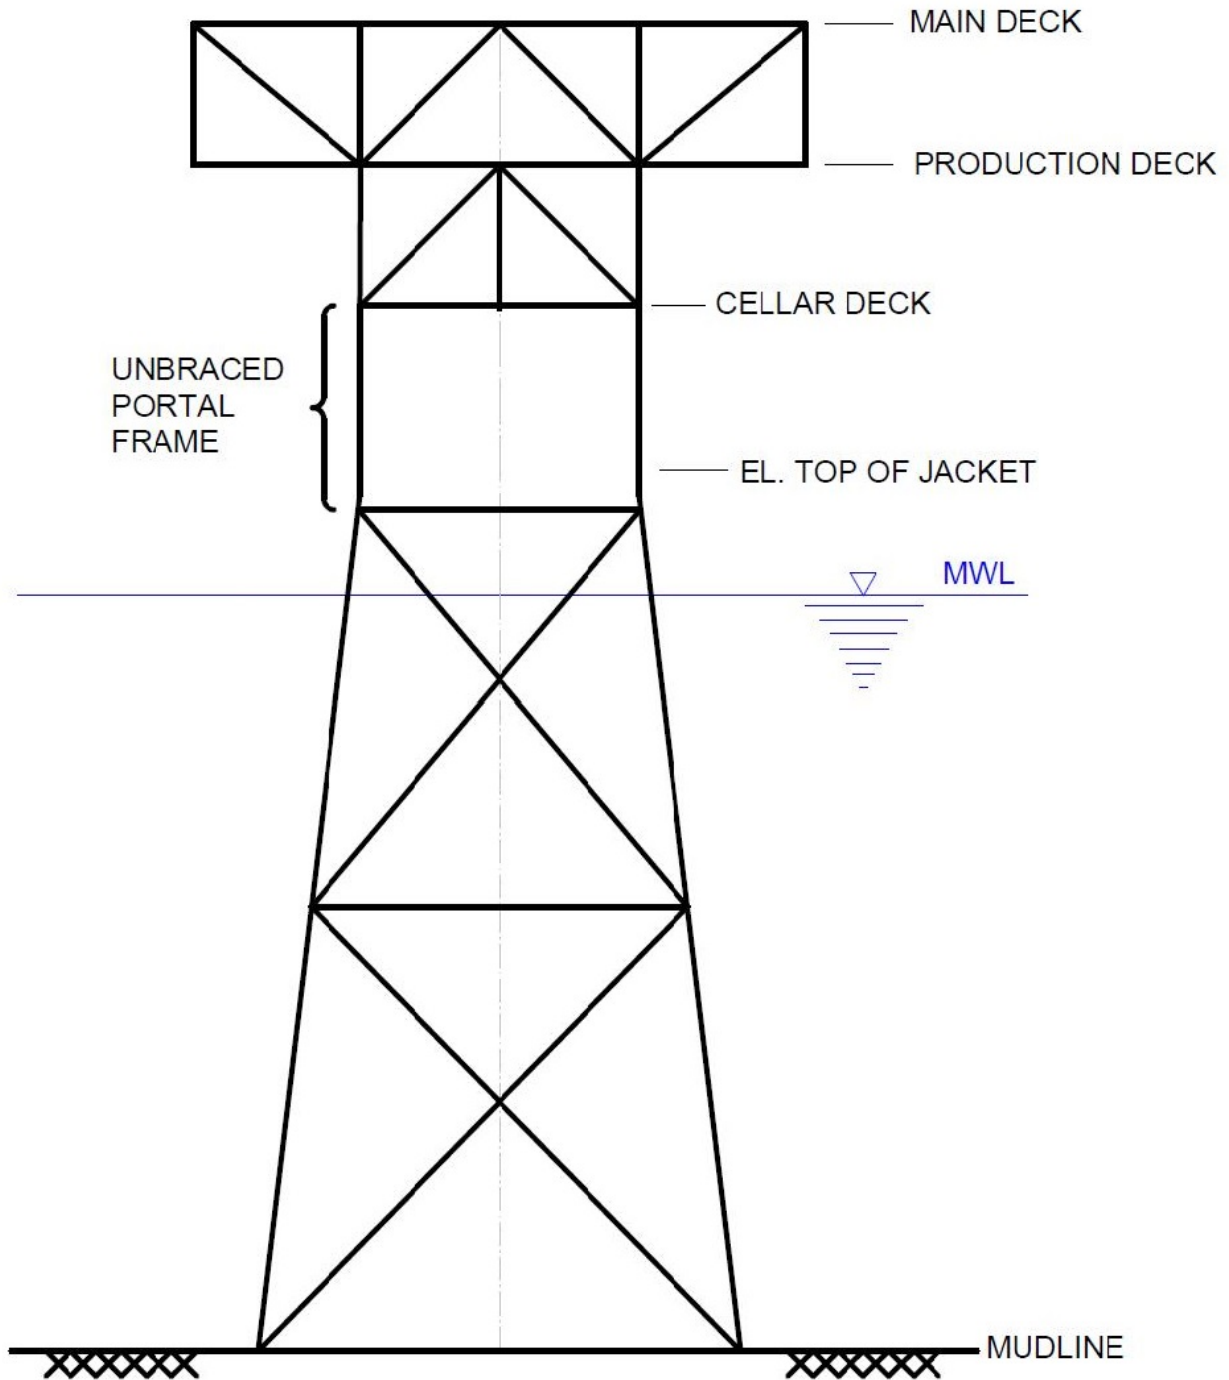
Unbraced Portal Frame between Lowest Deck and Jacket
